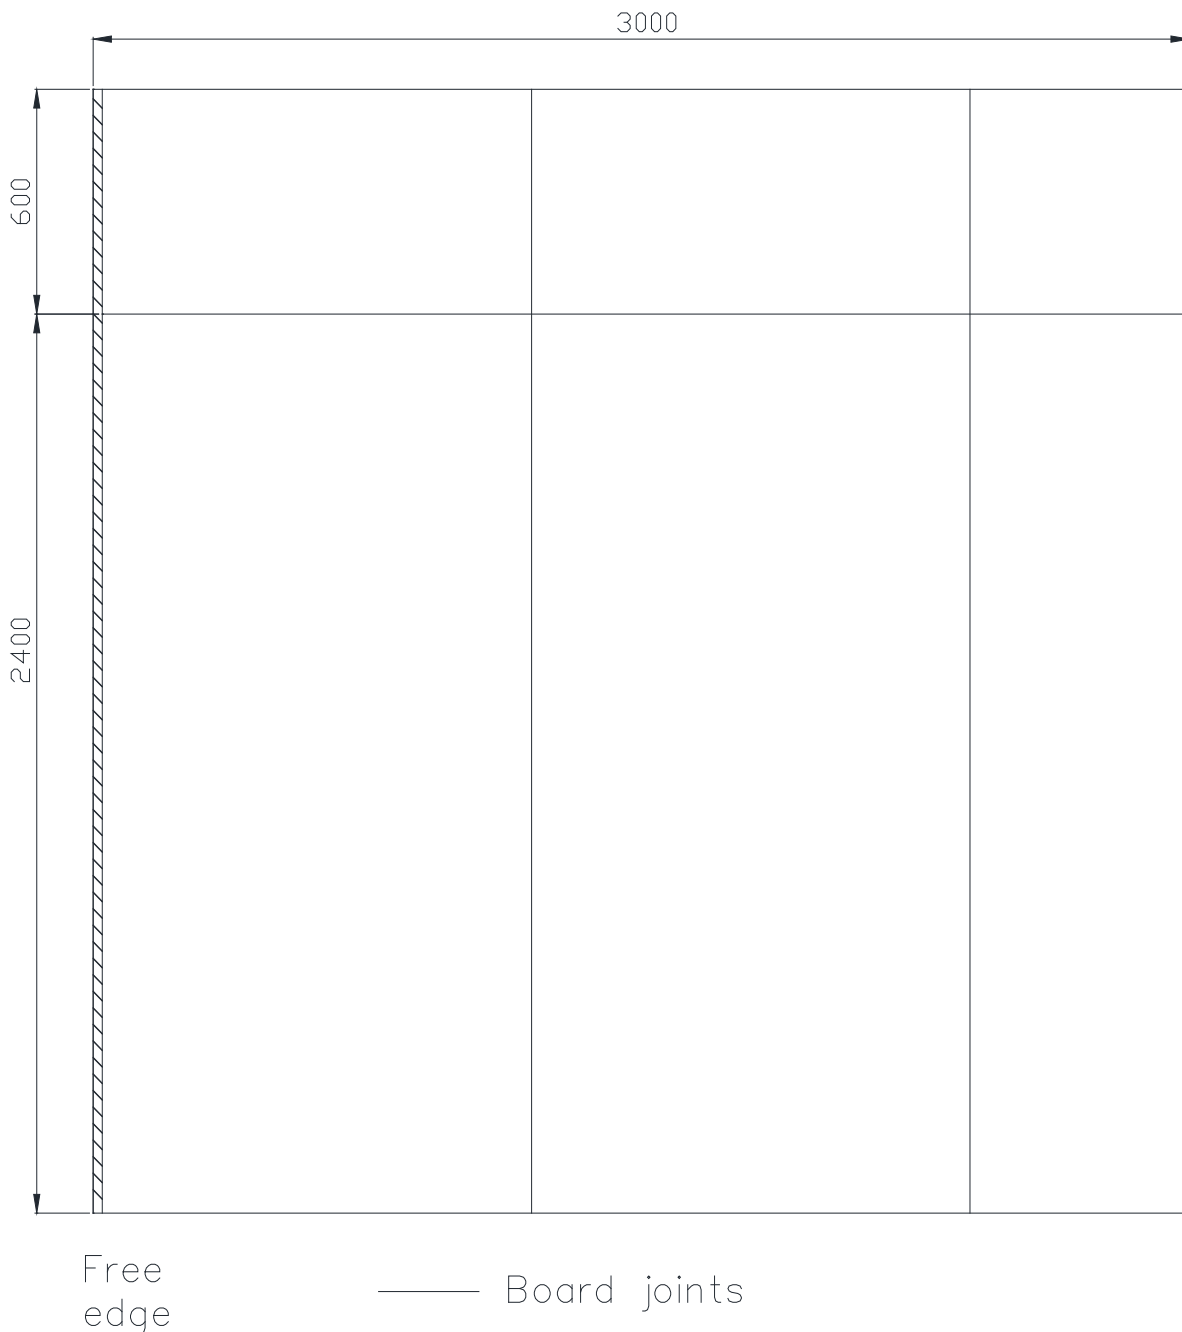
Exposed Face Elevation Inner Layer – Glasroc X Sheathing Boards.
